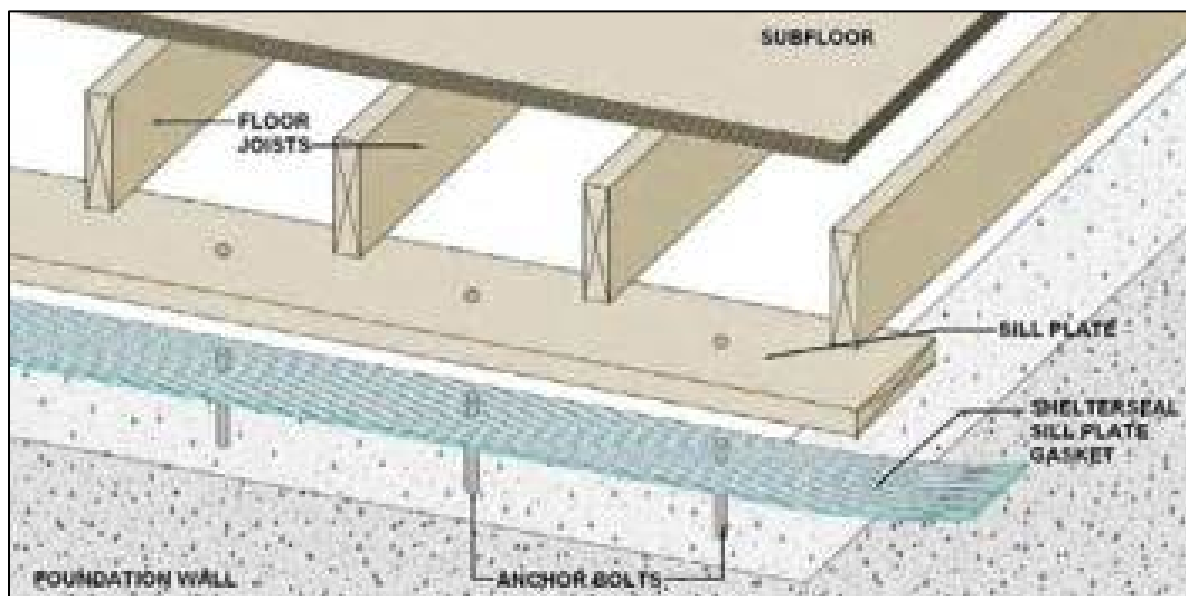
Building floor diagram, showing mud sill (ShelterEnterprises, 2017).
